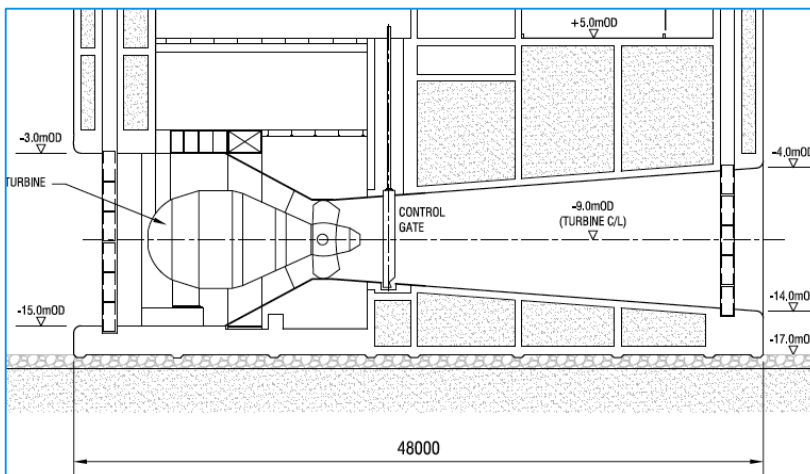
Cross Section through concrete structure and bulb turbine proposed for the Duddon Estuary (© Parsons Brinckerhoff, 2010)
